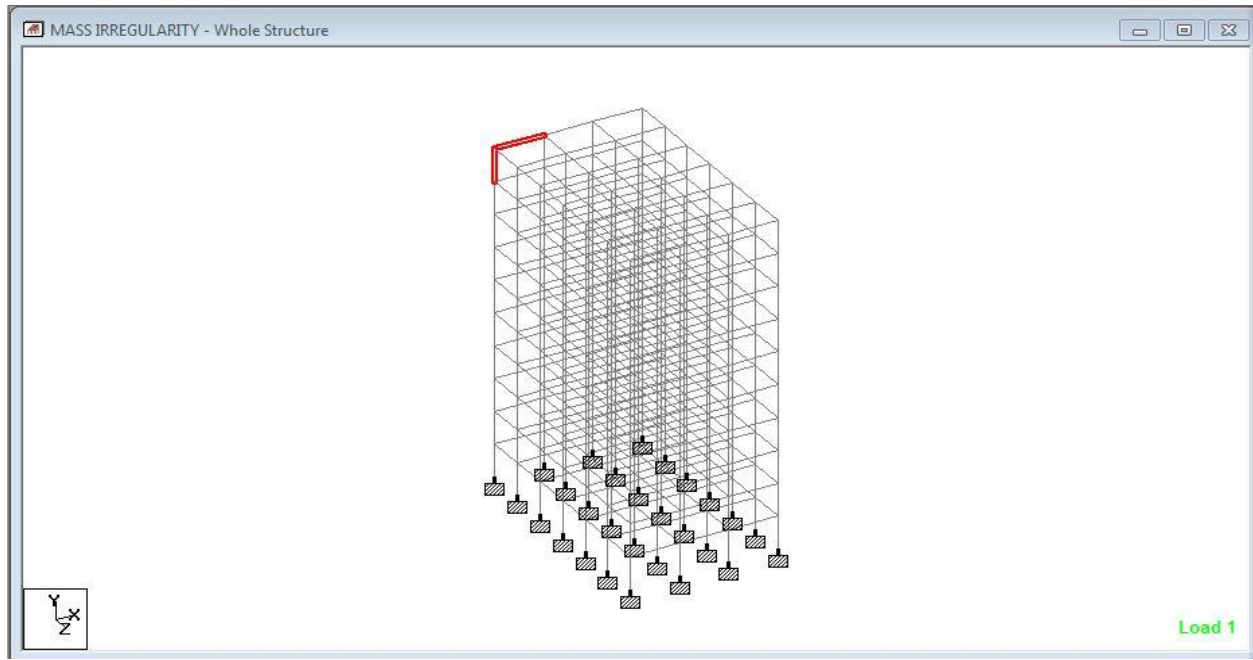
3-D view of a 10 storey mass irregular structure with highlighted beam and column
